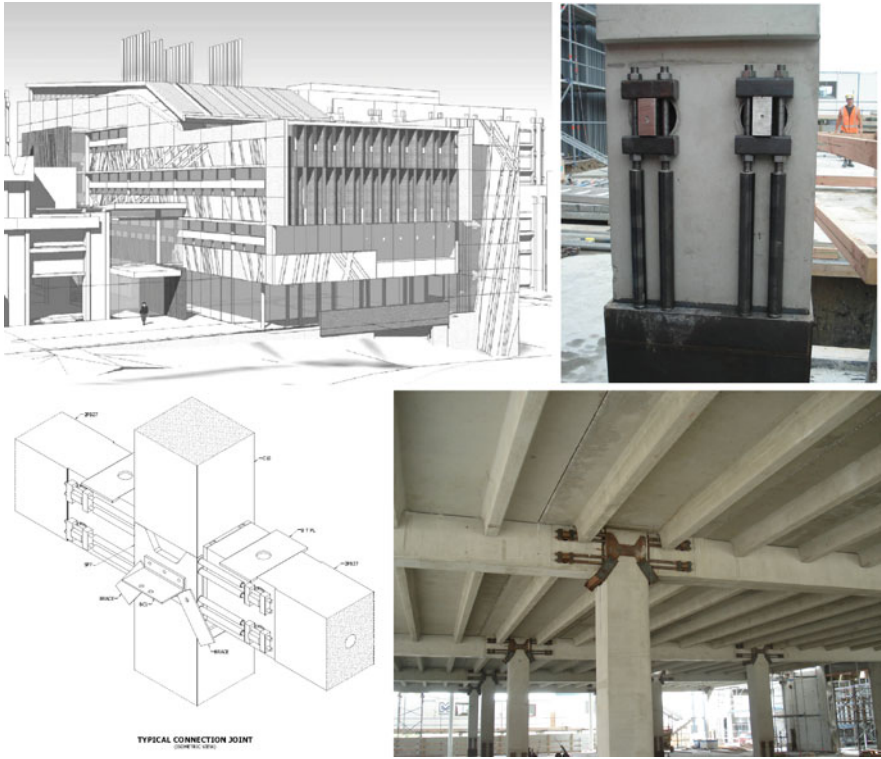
Rendering of the first multi-storey PRESS-Building in New Zealand (design details in Cattanach and Pampanin [3]: schematic and photo of beam-column joint and column-to-foundation connection details, implementing “plug&play” external replaceable dissipaters
